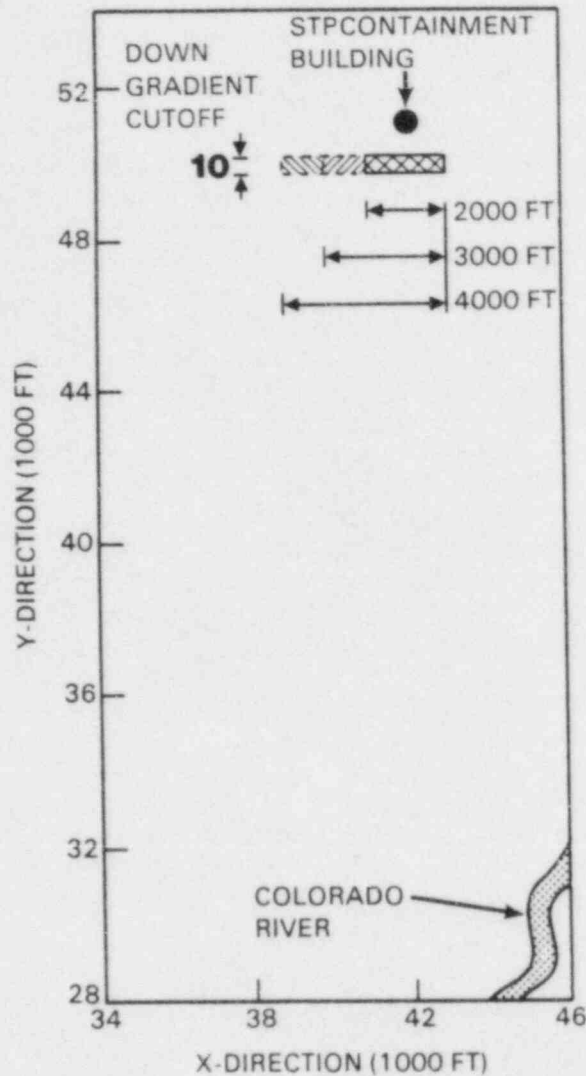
Location of Down-Gradient Cutoff Wall
